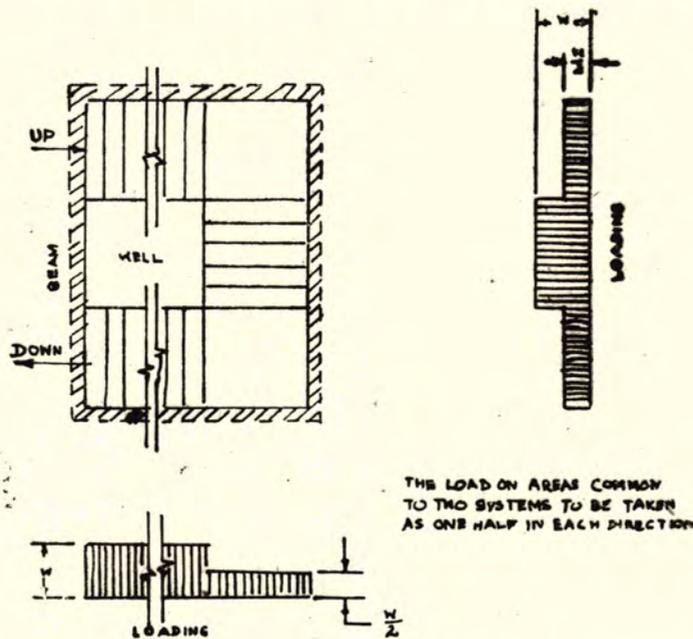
LOADING ON STAIRS WITH OPEN WELLS
